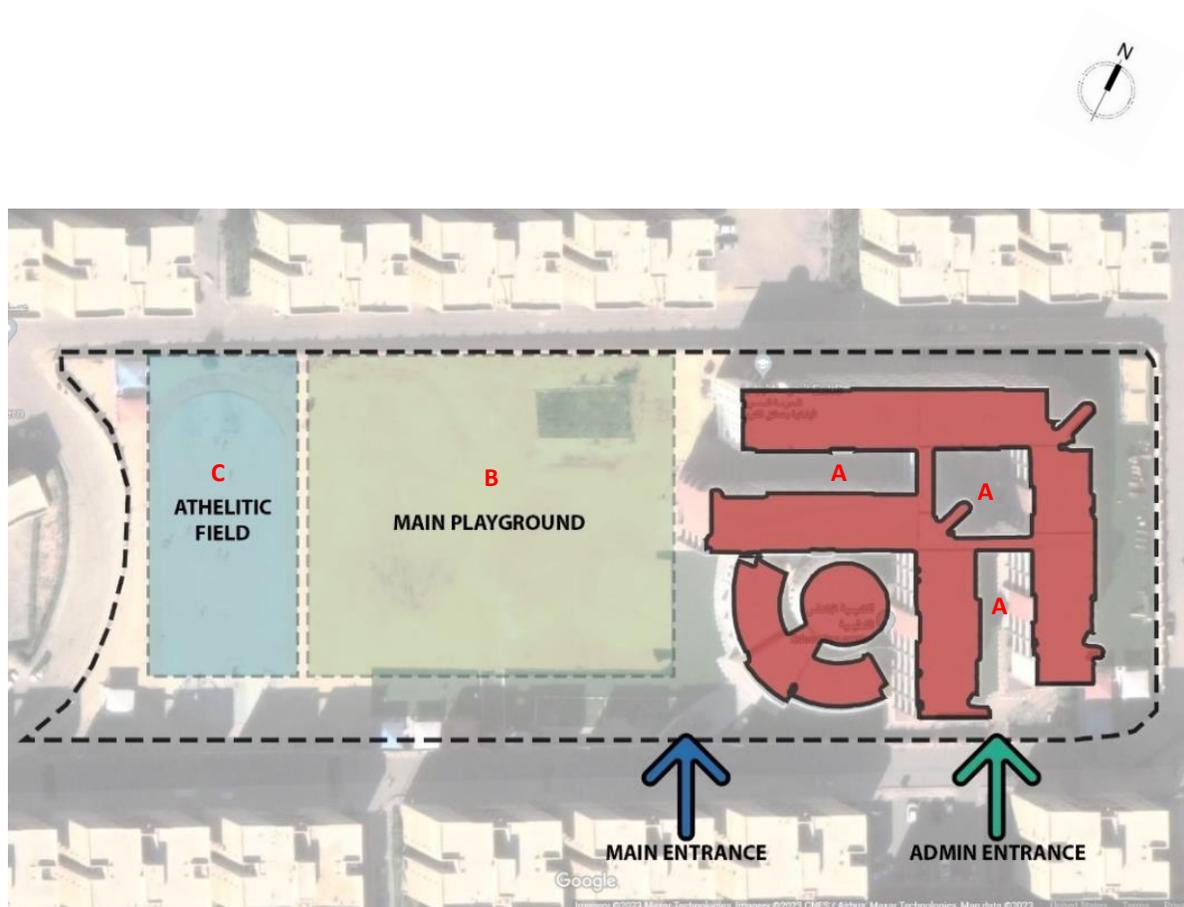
EJS Simplified Site / Building Layout (By: Author)
